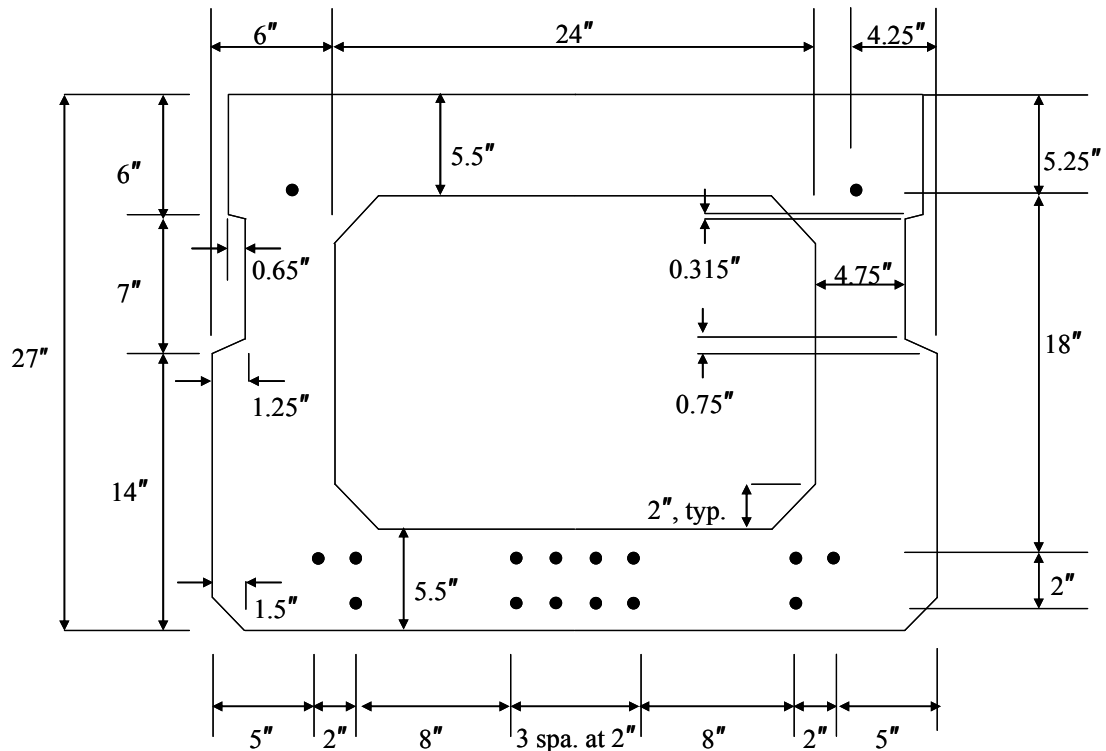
Cross-sectional geometry and strand configuration for box girders.
